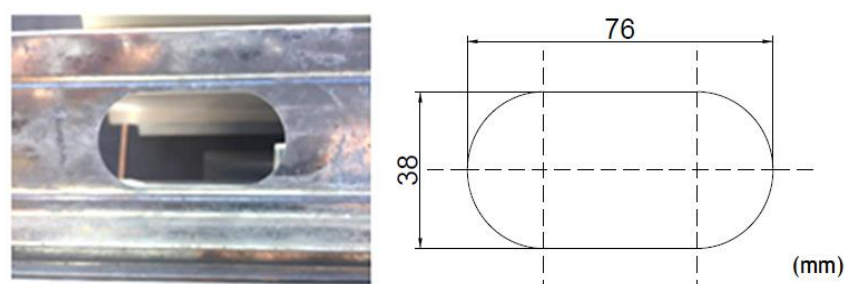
Hole in the stud for passage of electrical and hydraulic installations
